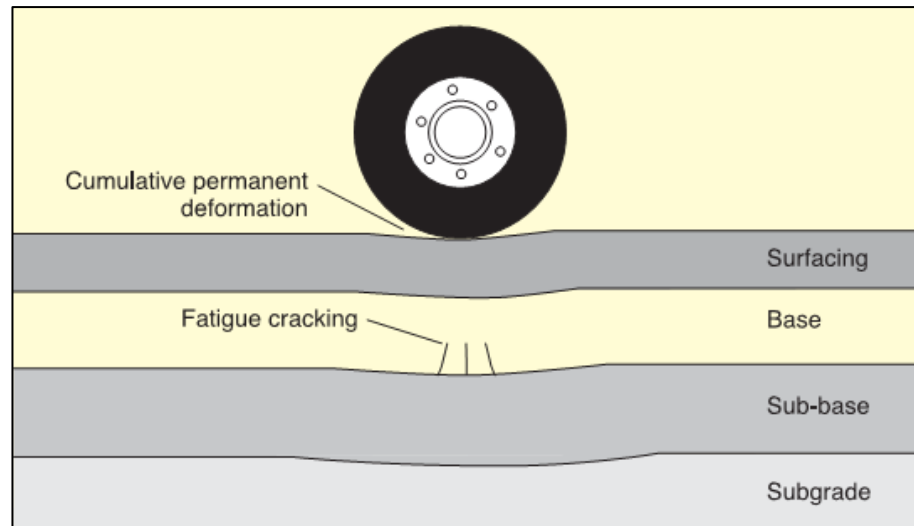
Fatigue cracking in asphalt or flexible pavements (Read and Whiteoak, 2003)
